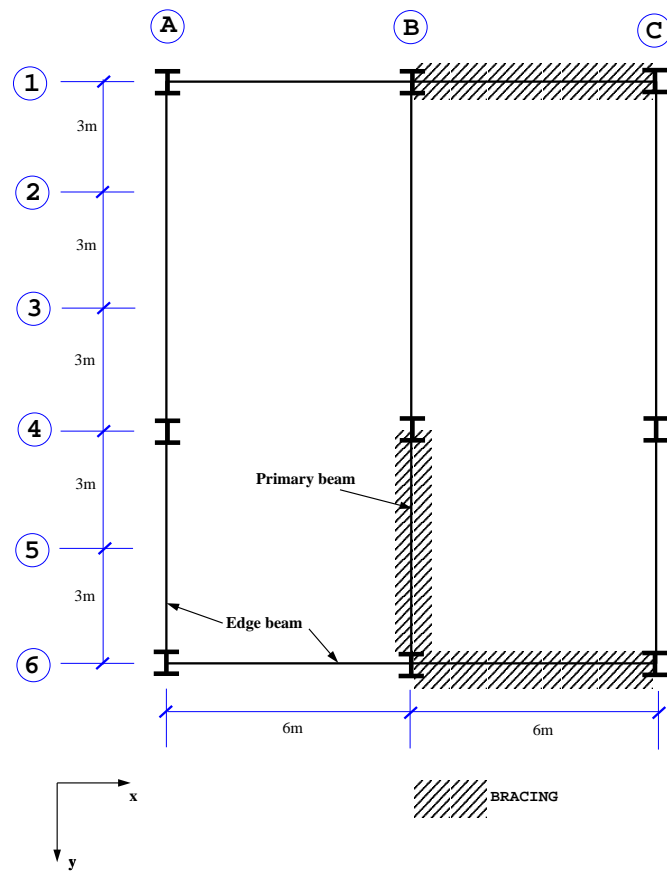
Schematic plan view of the 2x2 bay generic frame with all the secondary beams removed
